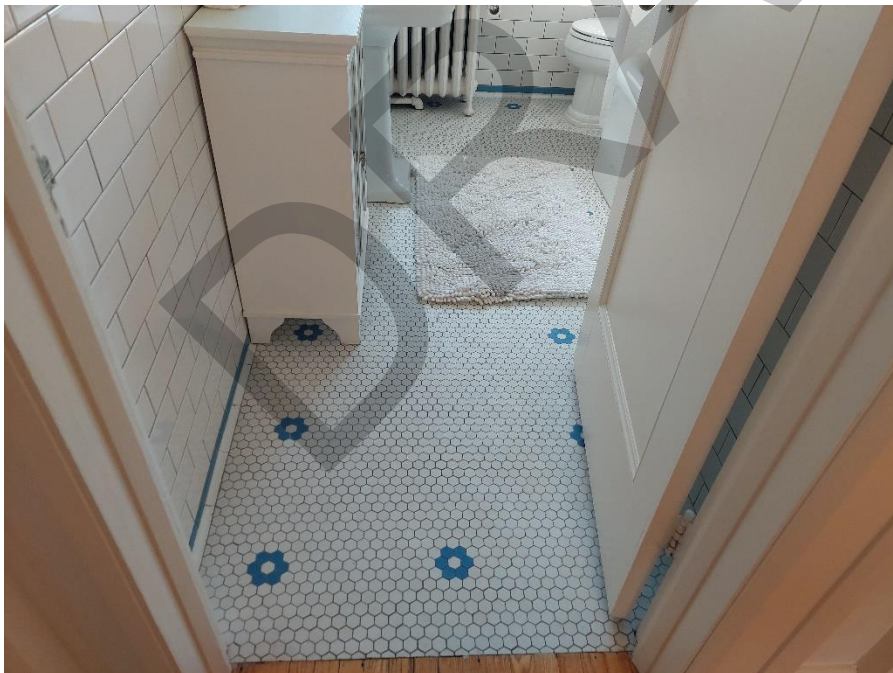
Detail of tiling in the third floor bathroom (A.S.I. 2022).
